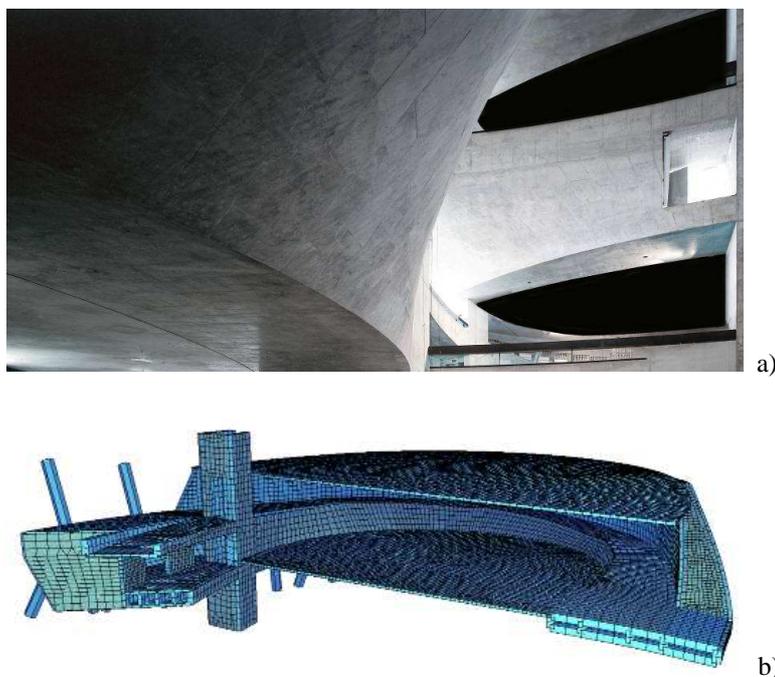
Mercedes-Benz Museum. a) View from inside (Brigida Gonzalez) b) Myth ramp structural model (Werner Sobek Stuttgart)
